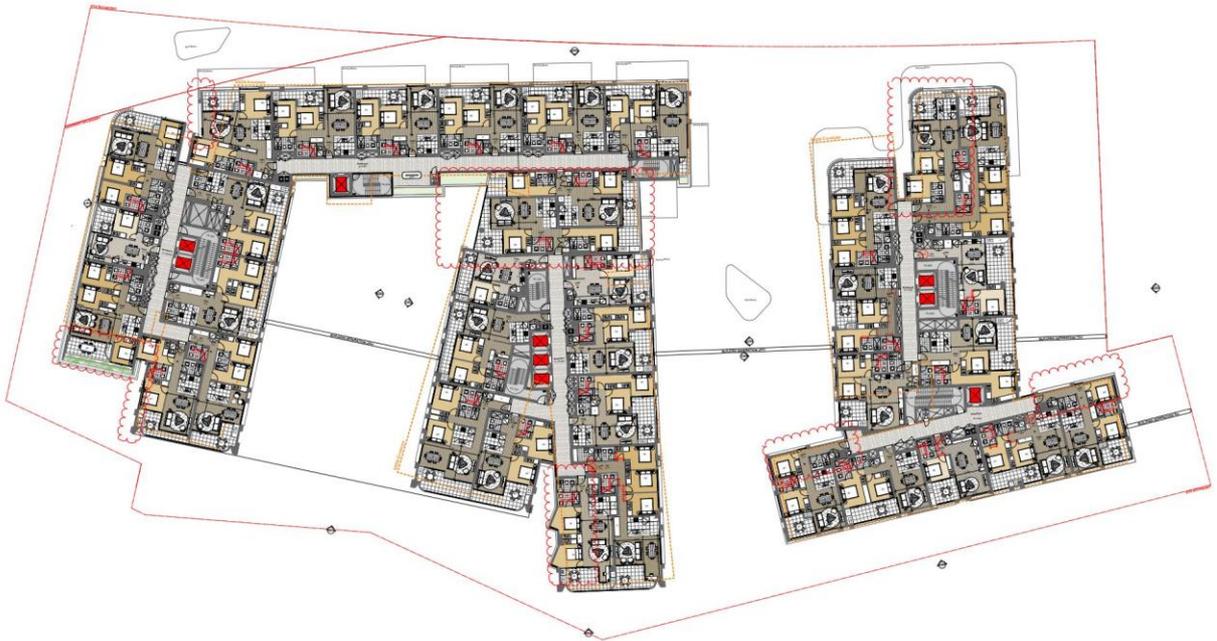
| Level 1 to 4 floor plan (Source: Applicant's RTS)
